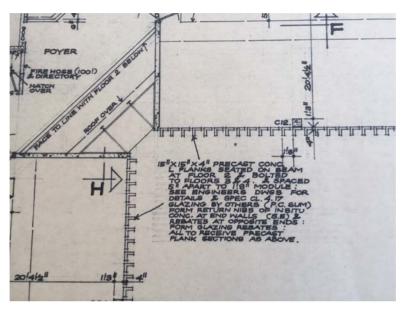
Plan detail showing 'Plank' arrangement on office wing walls overlooking courtyard
